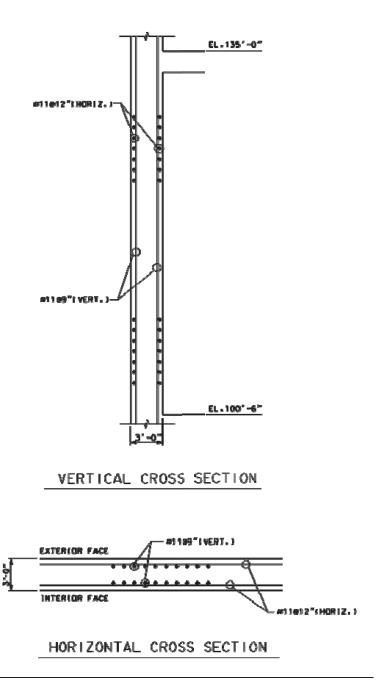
A-56 Reinforcement Arrangement of the West Wall of the EDG Building
